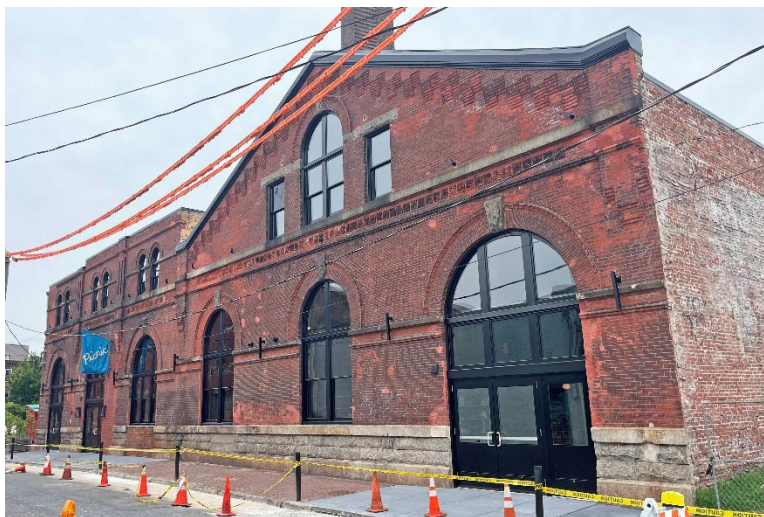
Boiler House, north elevation, looking southeast. The Storage Building is shown at far left.
